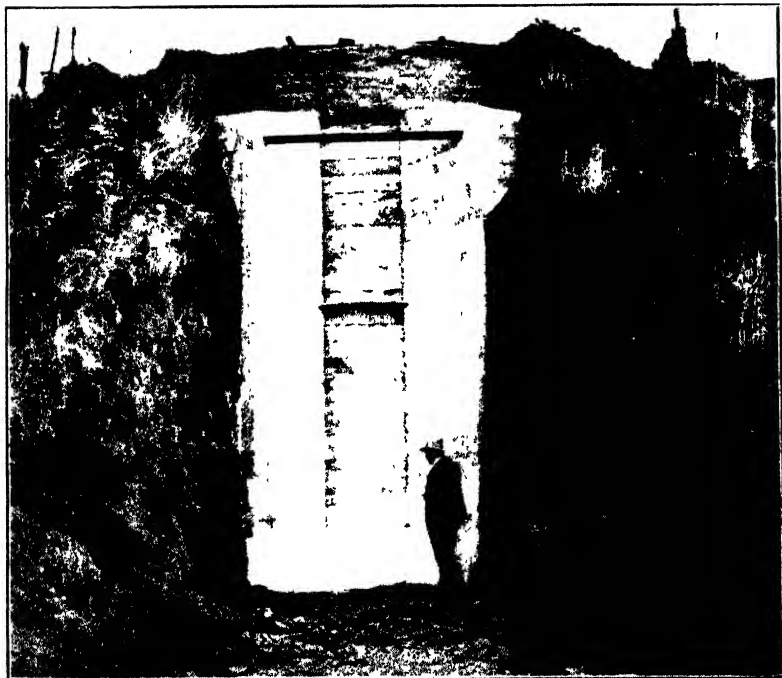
PIT WITH CONCRETE FACINGS AND TOP, SITUATED AS SHOWN IN FIG. 2.
